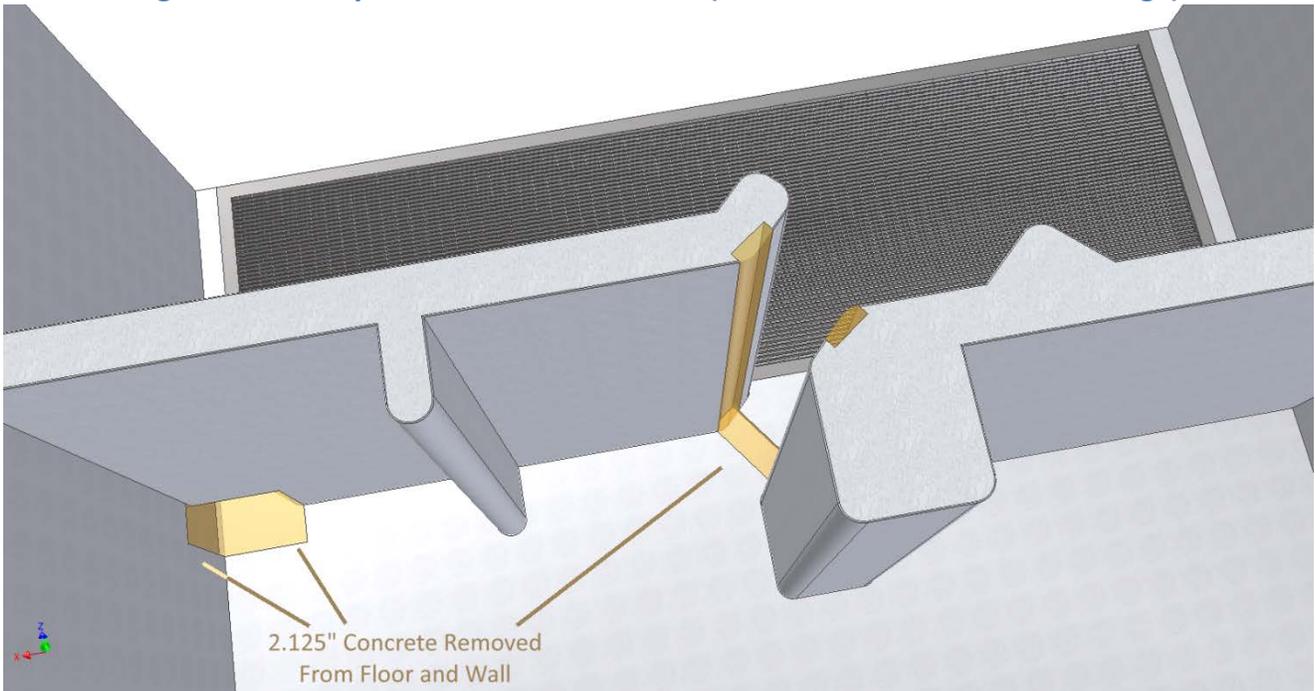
John Day North Slot Concrete Cuts (cut concrete in translucent orange)
